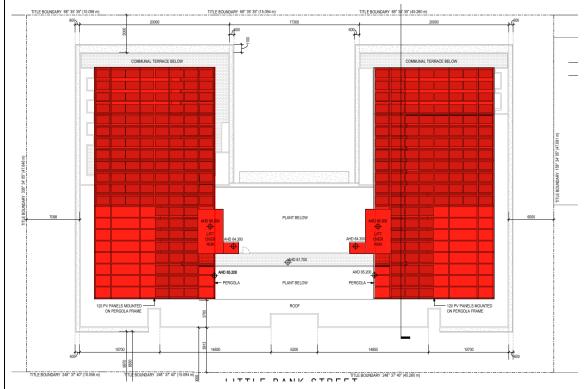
Rooftop plan showing the extent of offending structures above 60m height limit
